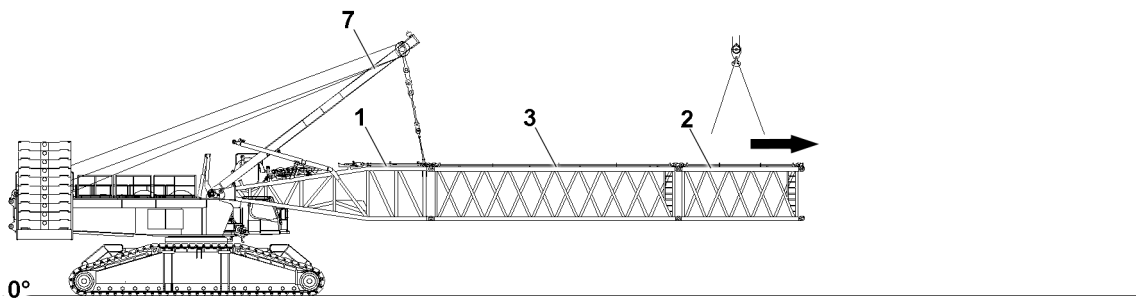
Disassembling the D-intermediate section on the D-intermediate section
